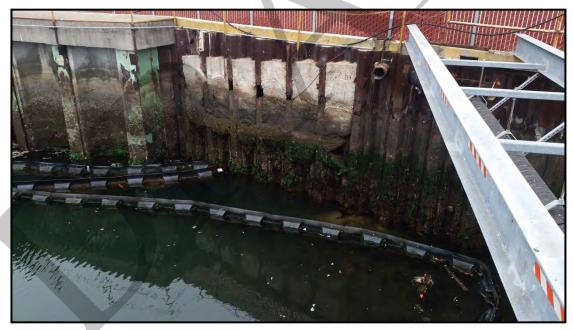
Original steel sheet pile wall at south side of Pier 1.
